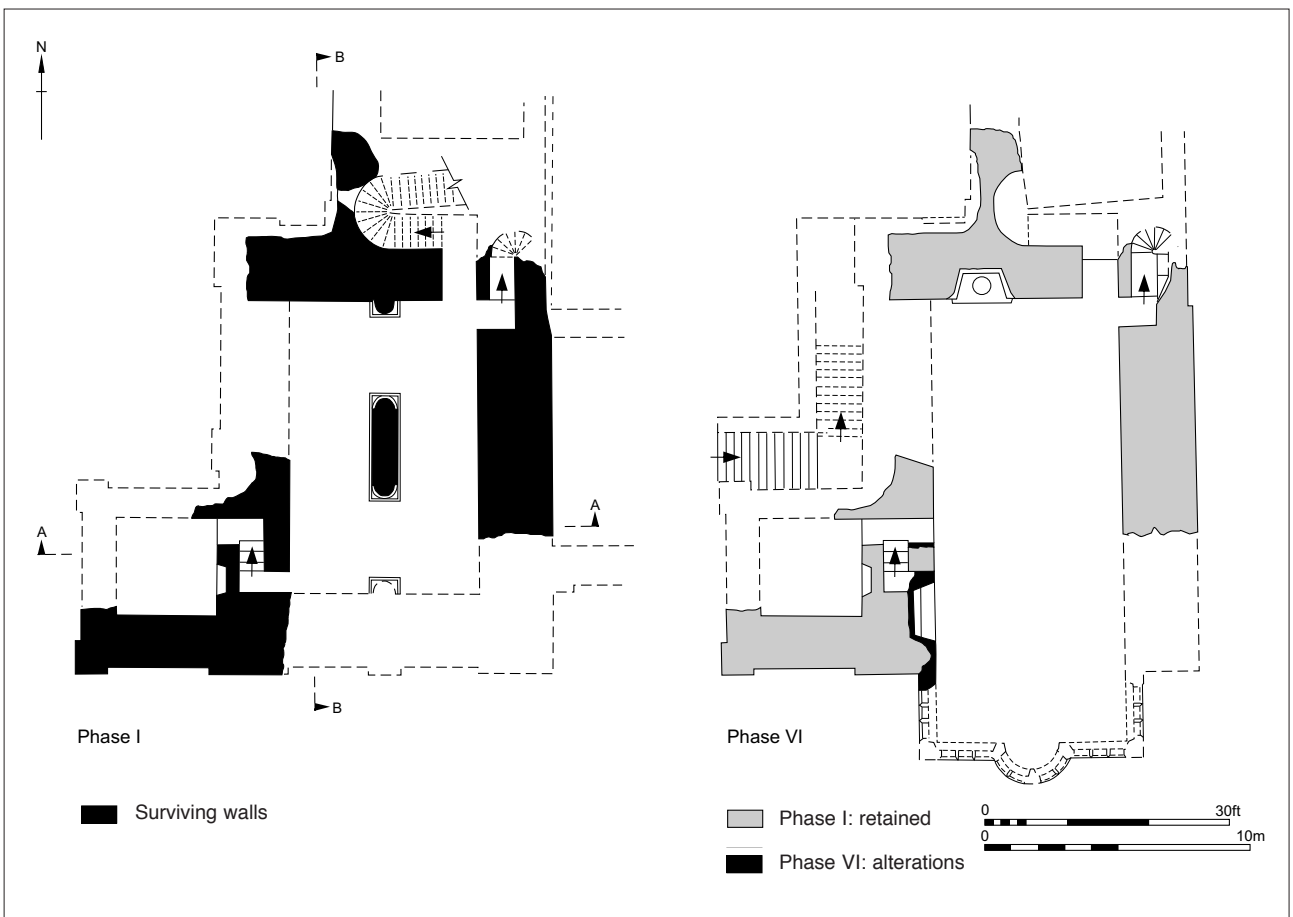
The central building complex: second-storey plan of the great tower showing Phases I and VI
